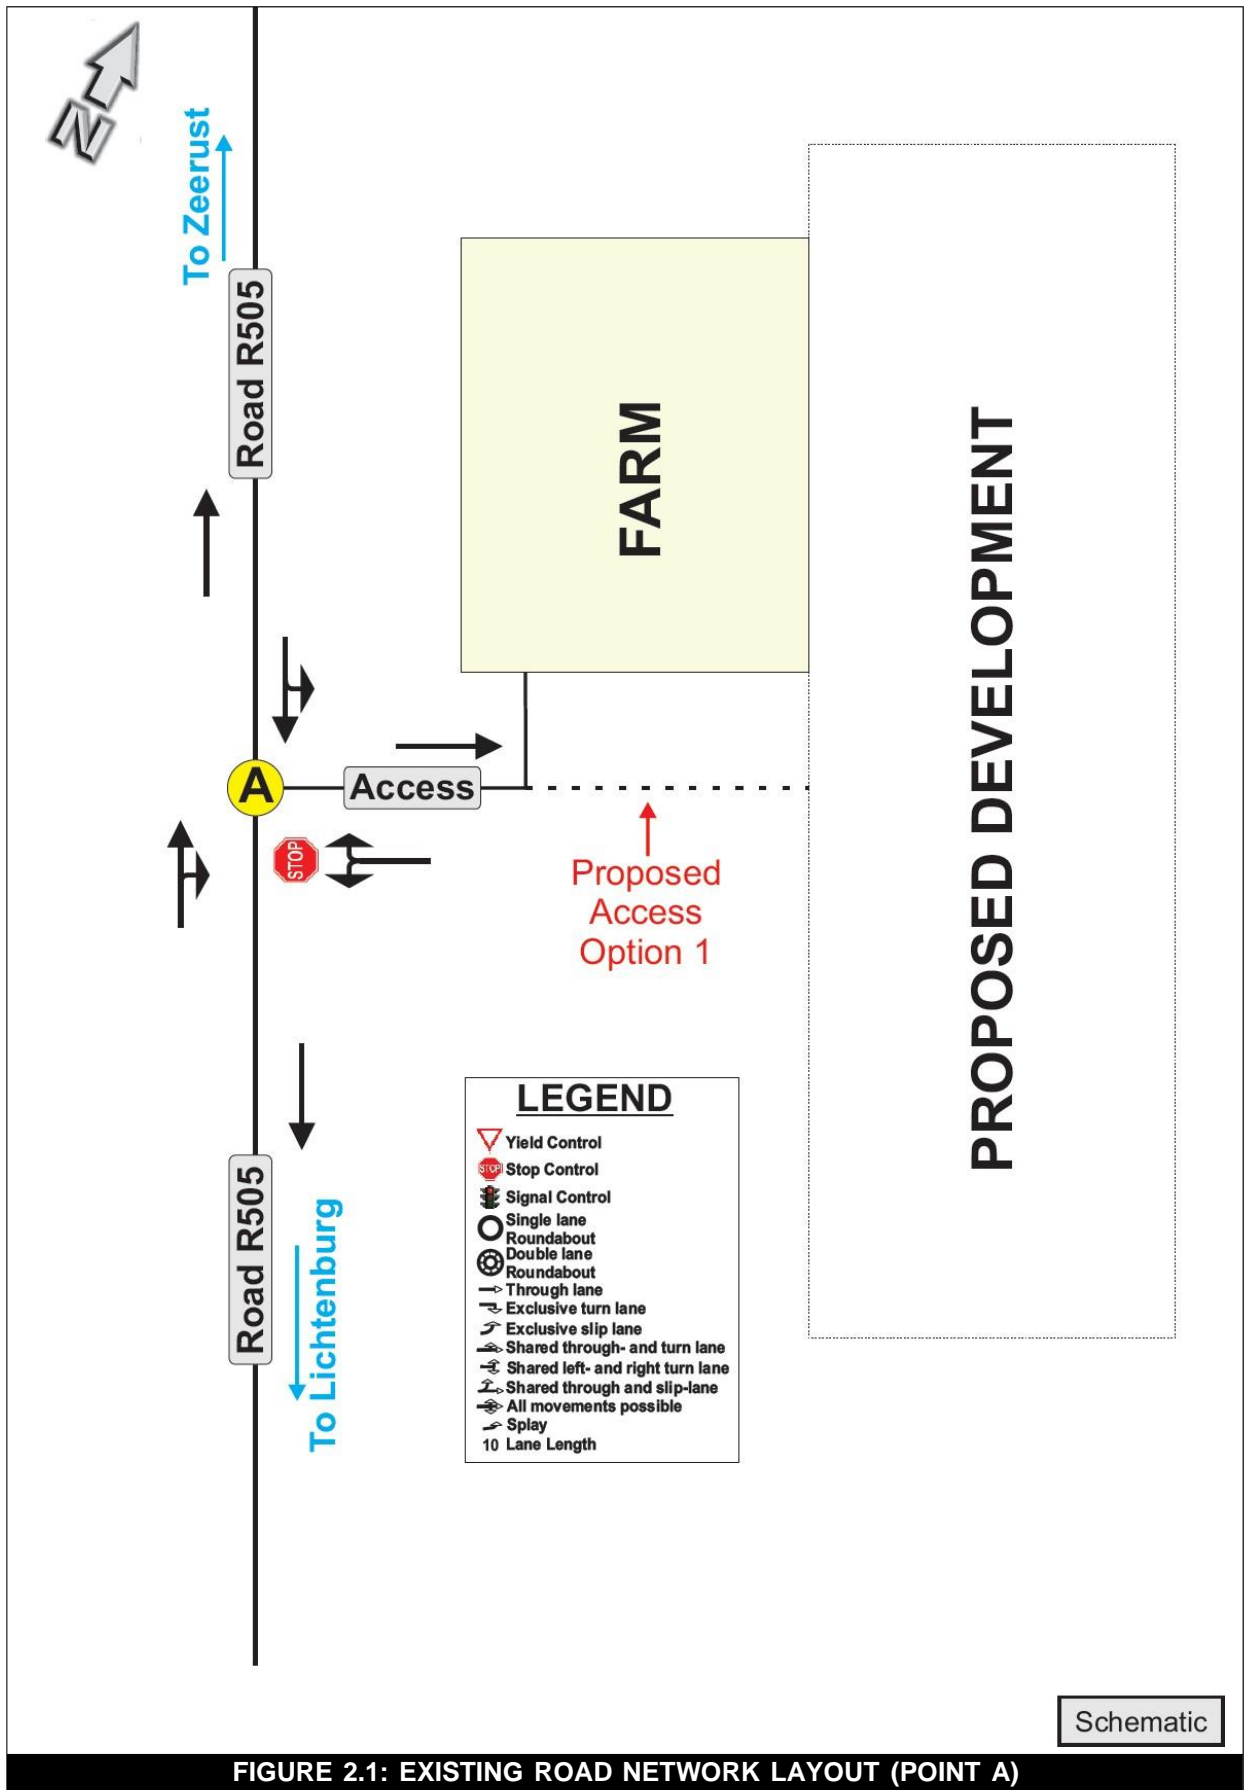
EXISTING ROAD NETWORK LAYOUT (POINT A)
